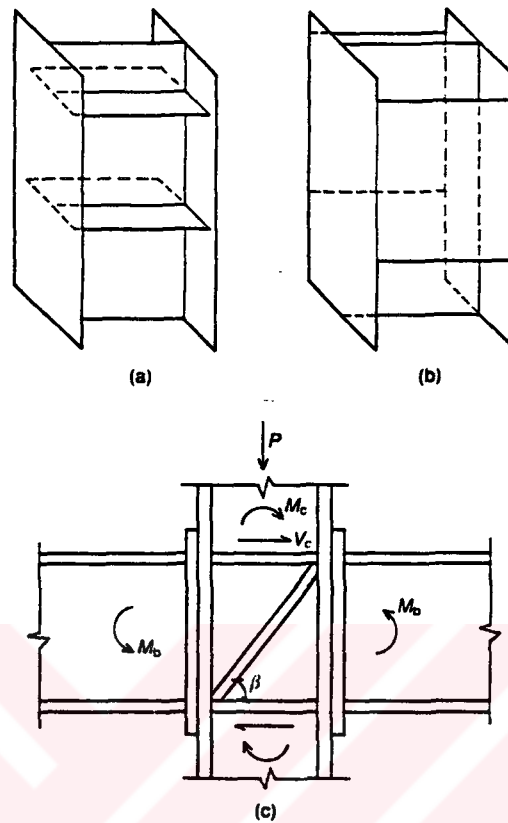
Column Stiffeners in the Panel Zone: (a) Web Stiffeners; (b) Doubler Plates; (c) Diagonal Stiffeners
